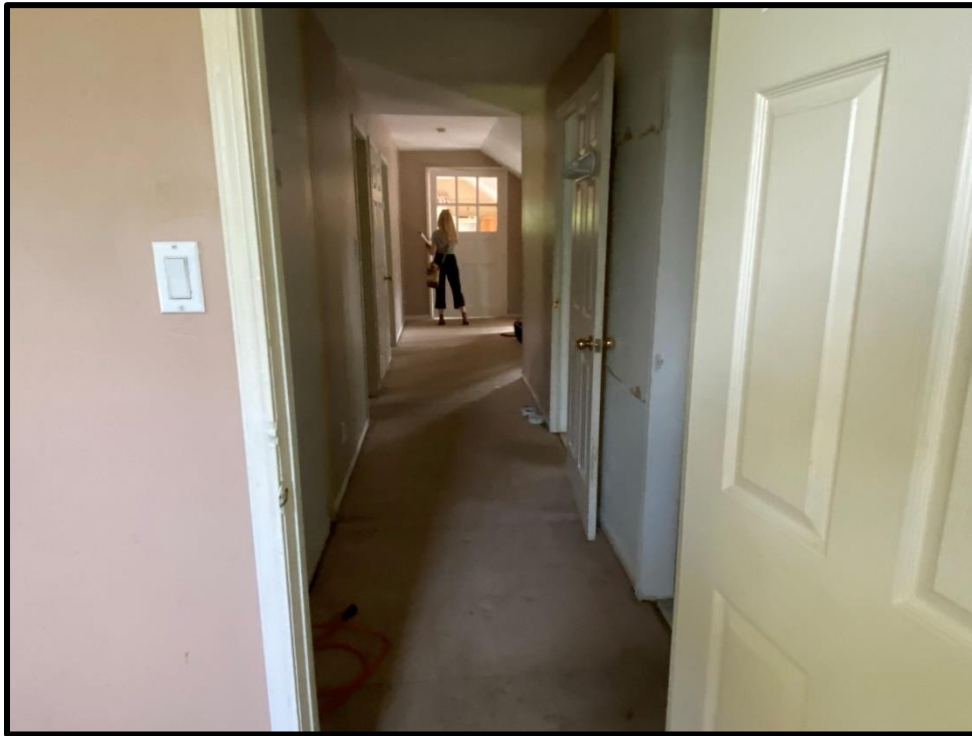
Second Storey Room - Drywall Bump Out at Left Showing Location of Connecting Tie Timber
